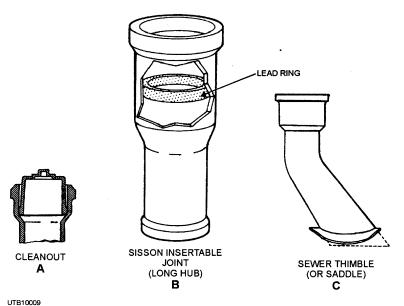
Adapter-type cast-iron soil pipe fittings.
